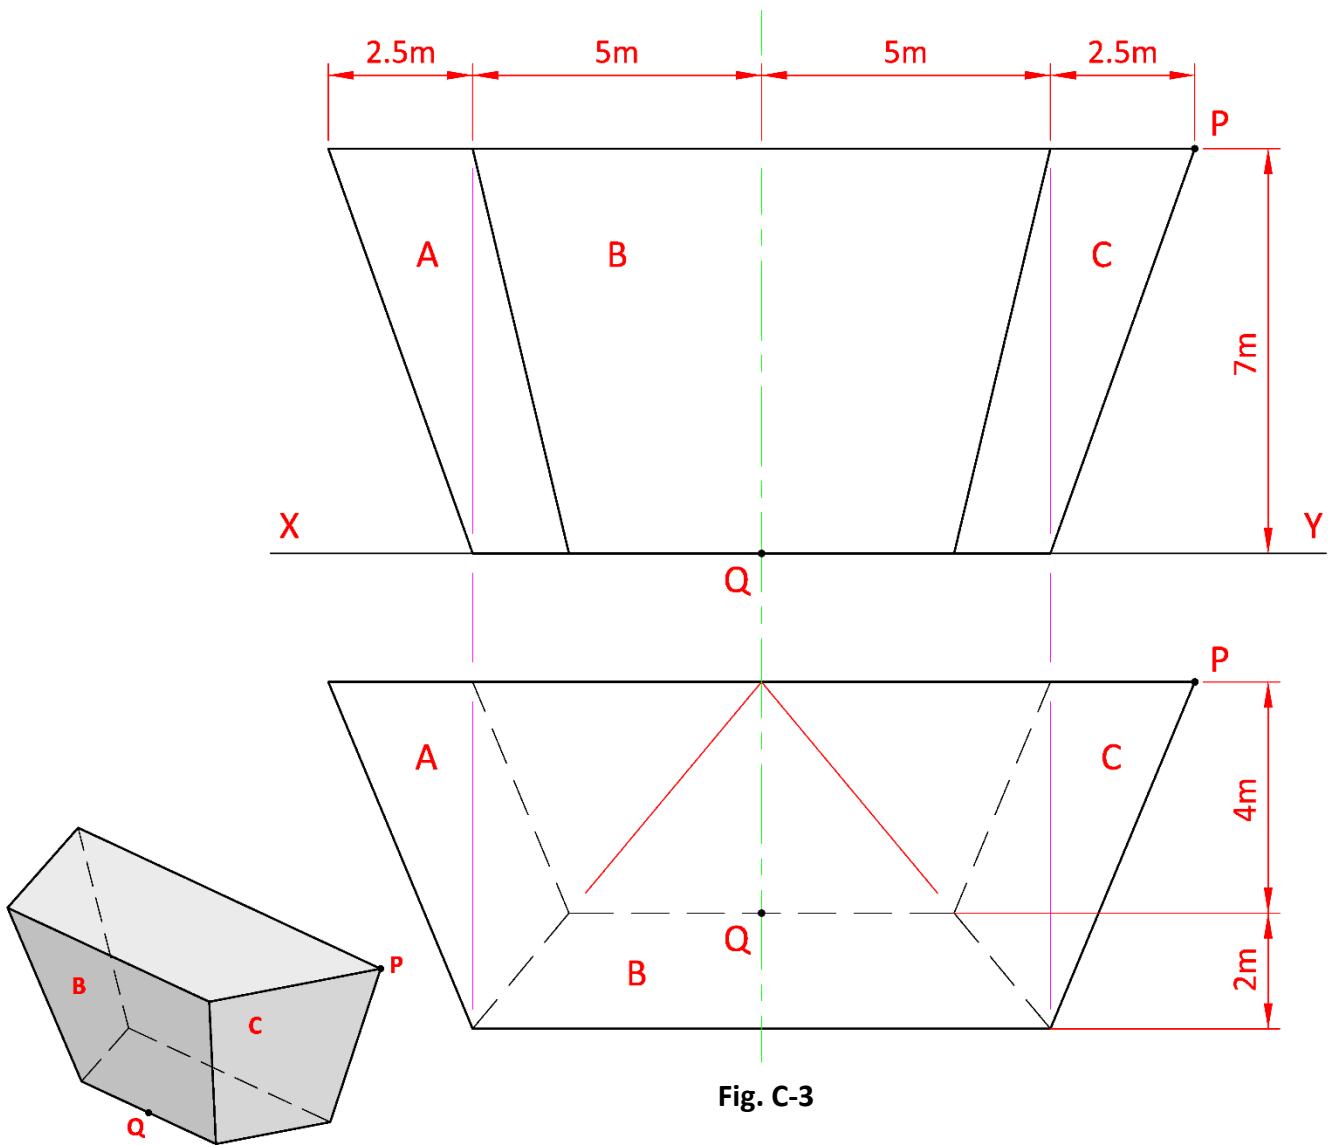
shows the plan and elevation of a similar climbing wall. A pictorial view is also given.
